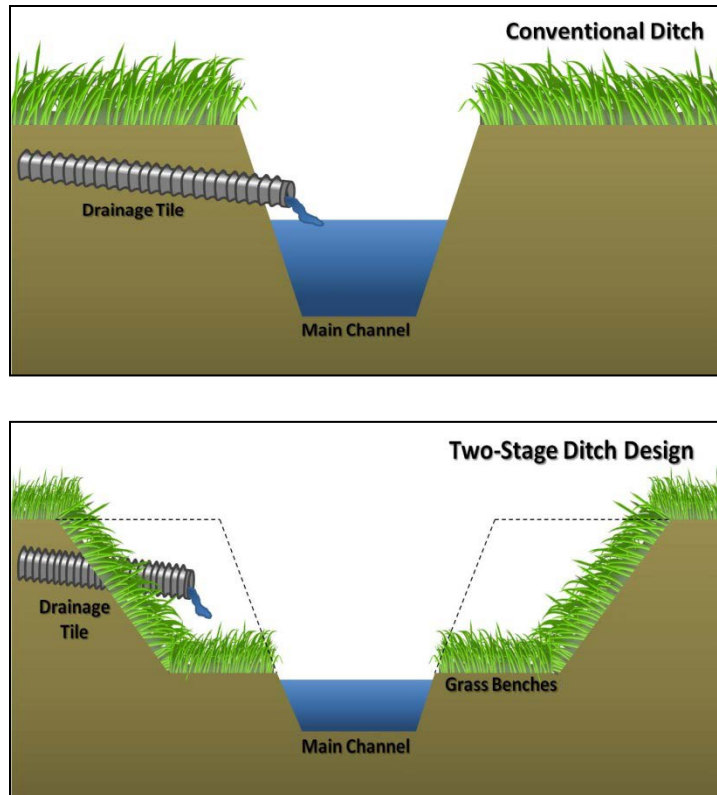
Schematic comparing conventional trapezoidal ditch design and two-stage ditch design.
